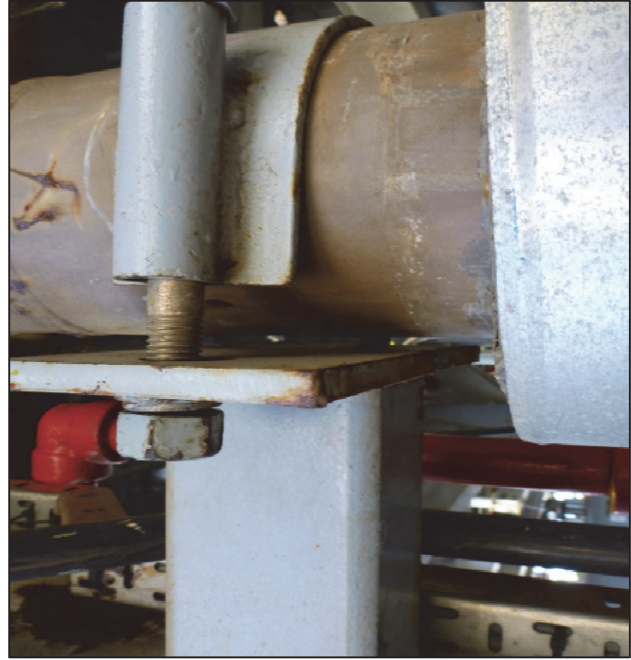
Piping should rest firmly against supports, using shims under the pipe if necessary.
